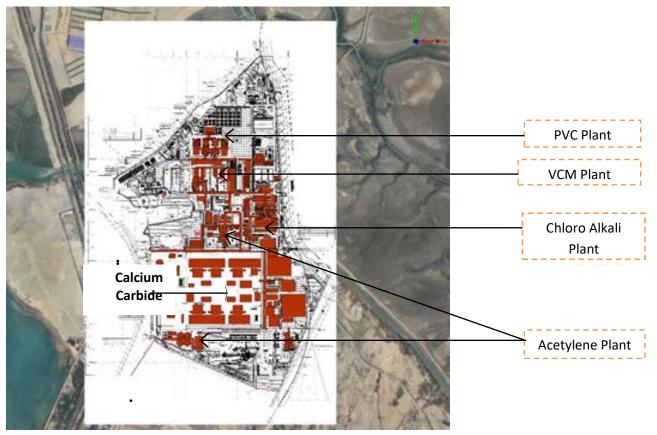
Zoomed Layout of Overall plant facilities with buildings
